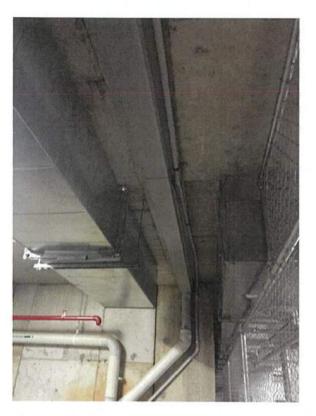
Sheet metal catch drain fitted to construction joint between the ground floor slabs of buildings A and B on B1. This drain was found to be leaking.
